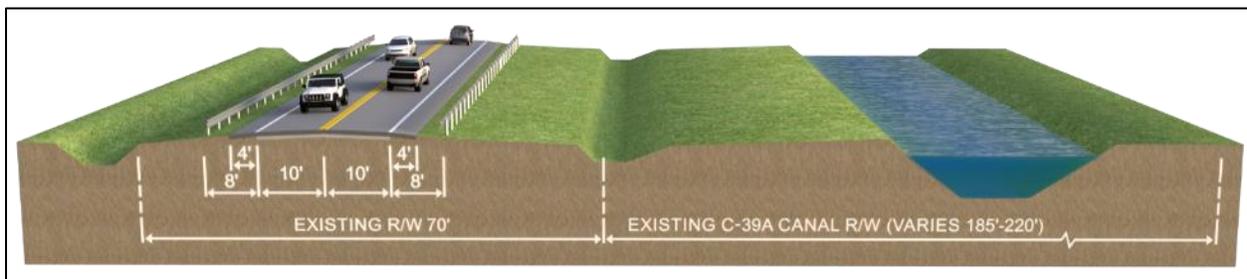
| Existing Roadway Typical Section from Harney Pond Canal C-41 to Indian Prairie Canal C-40
